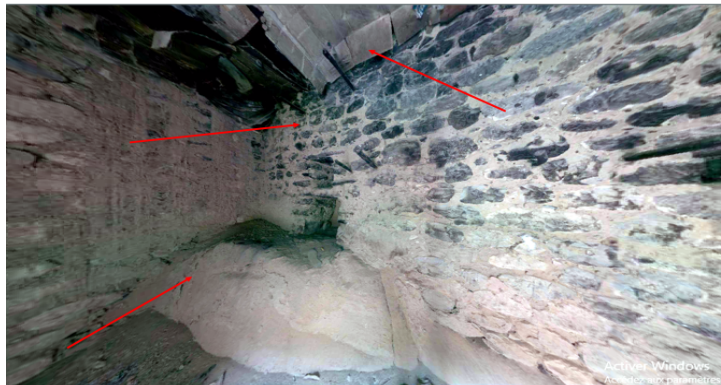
House 10 is built on the retaining wall of the ksar. Source : Authors.2024.
